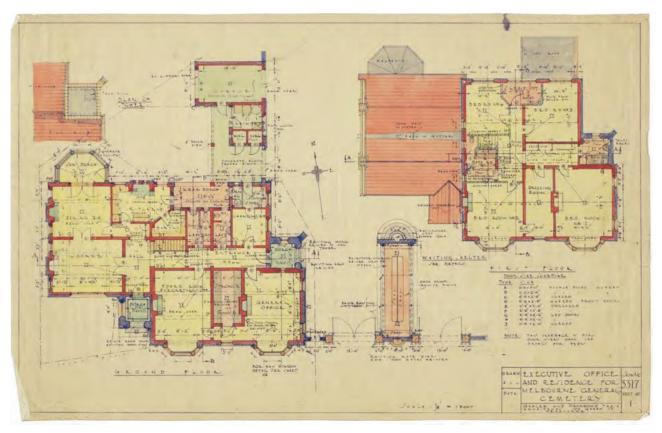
Plan of the gatehouse prepared by Gawler and Drummond Architects showing the ground and first floors of the gatehouse and waiting shelter, c. 1933 Source: MGC archive
